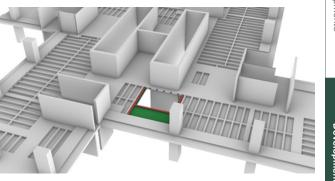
Slab adaptability diagrams from Volume One showing work to introduce risers into the existing floorplates
